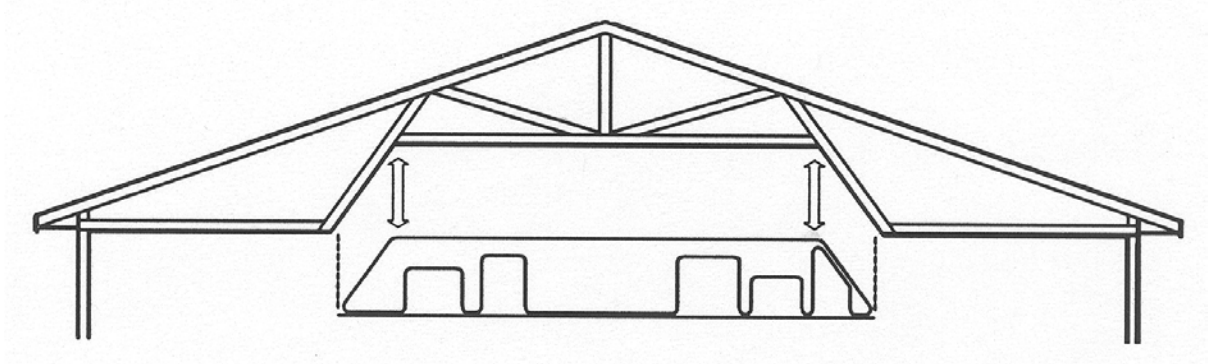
Coffered-ceiling roof trusses (from Phase I proposal)
